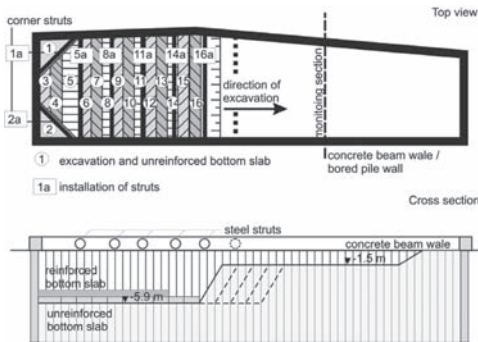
Top view and cross section of the excavation site with idealized construction stages.
